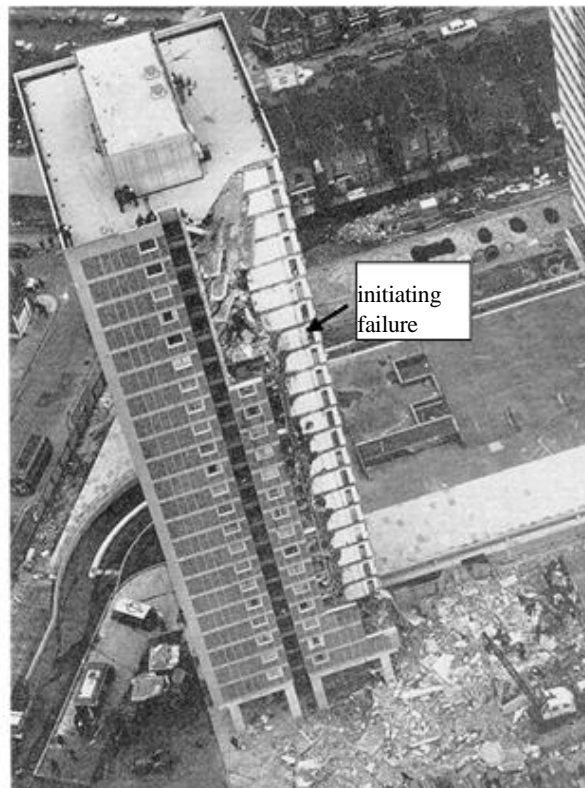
Ronan Point collapse: a gas explosion on the 18th floor resulted in a progressive collapse.
